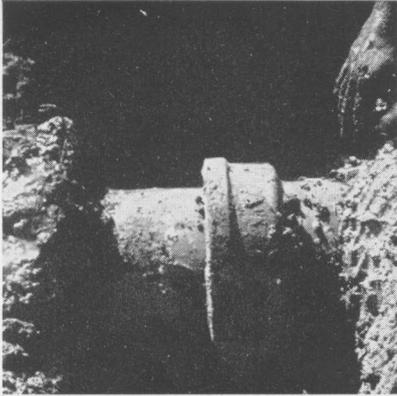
A hydraulic jack assembly, as shown, is used to pull the collar in place over the rubber ring to seal the joint of asbestos-cement pipe.
